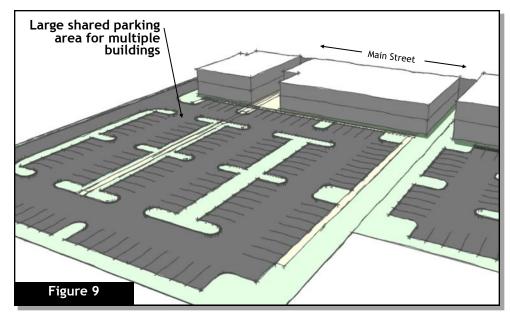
details a rear view of the shared parking complex as part of a larger development project with multiple buildings. The arrangement of the parking area and landscaping elements are covered in Sections D and E, respectively.
